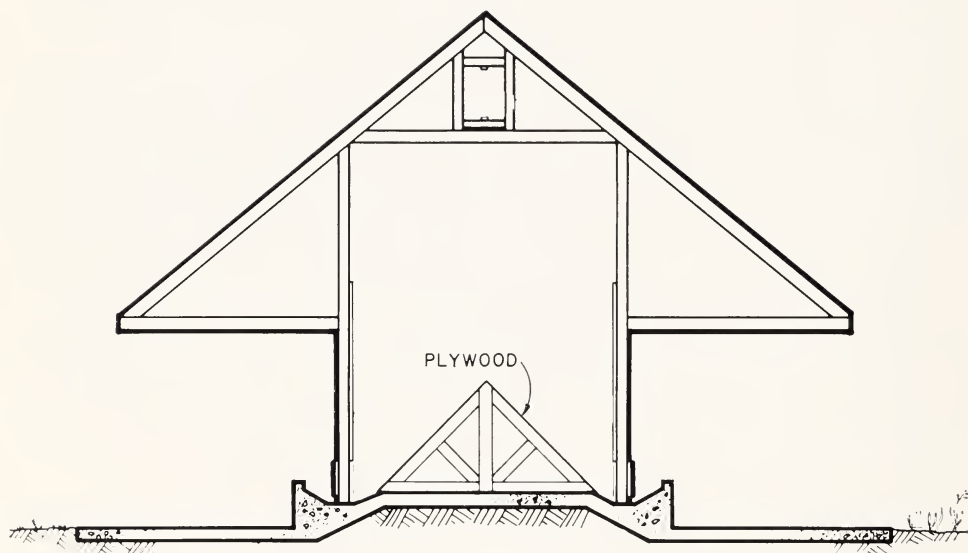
(above). Alternate barn-floor design to eliminate handling cubes in lower part of storage. Note reduction in storage space.
